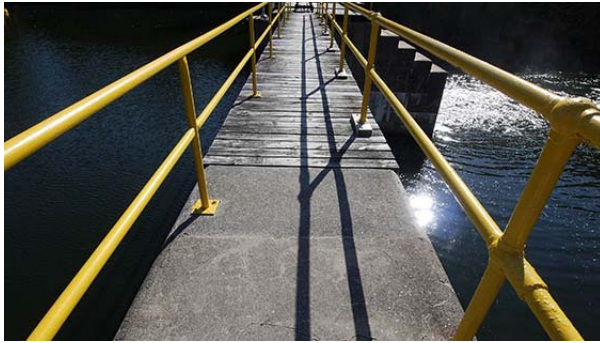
Timber and concrete characterize the walkway above the dam. [HCS 2016]
